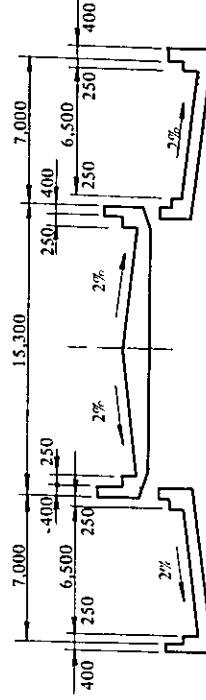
WIDTH AND CROSS SLOPE
